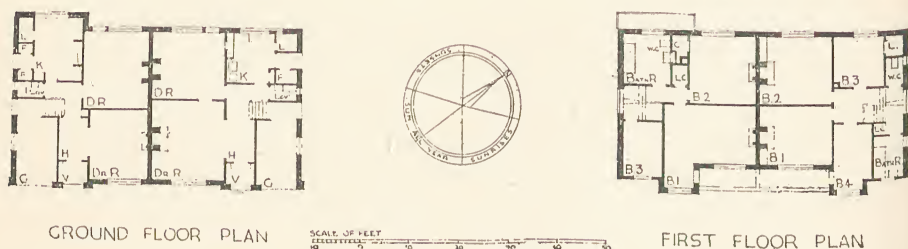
PLAN OF HOUSES AT HAMPSTEAD GARDEN SUBURB
